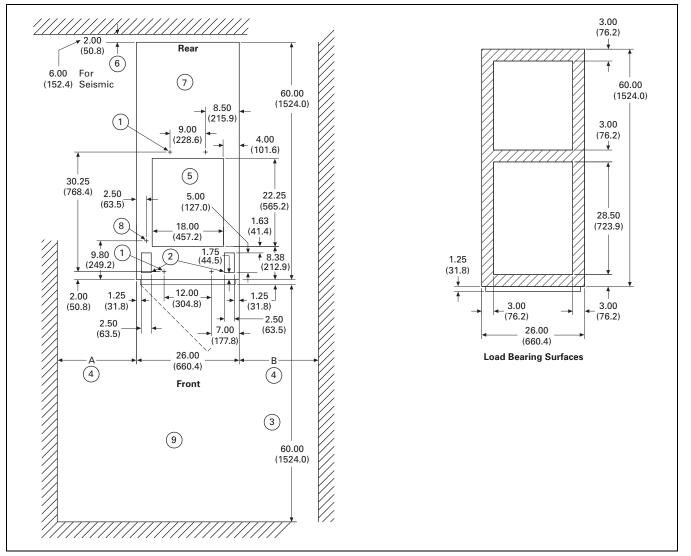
MEF 26.00-Inch (660.4 mm) Wide Unit Floor Plan
